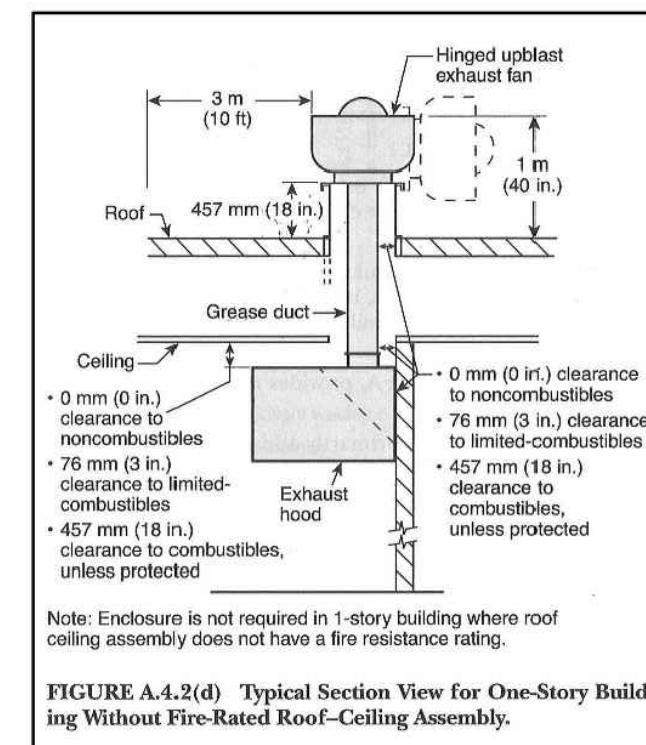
(d) Typical Section View for One-Story Building Without Fire-Rated Roof-Ceiling Assembly.
